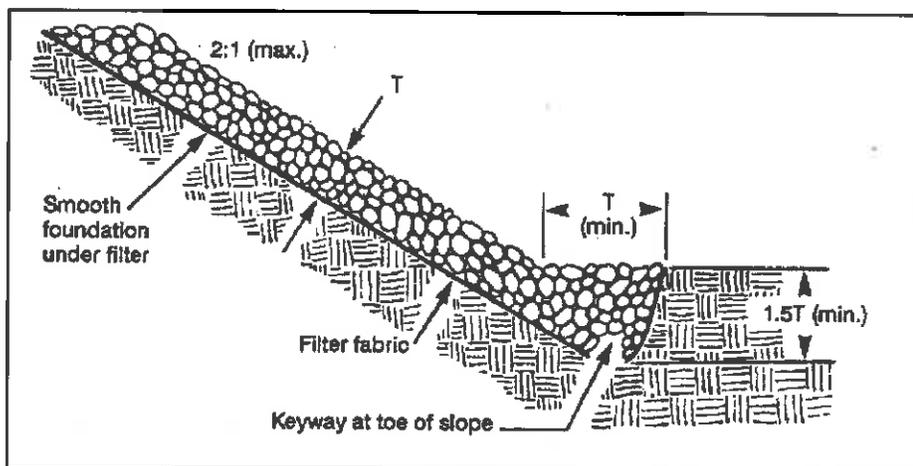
Construction of a riprap bank with toe protection (Source: Indiana Erosion Control Handbook)
